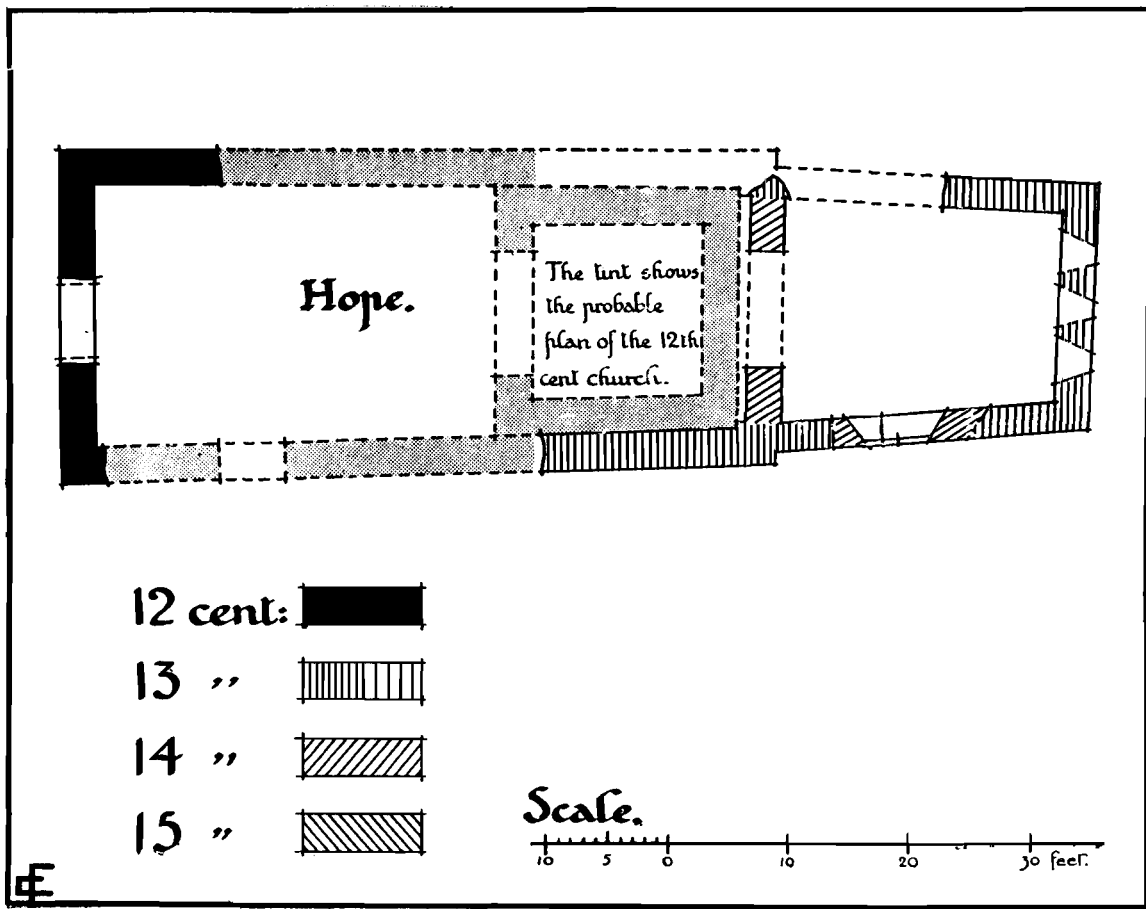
Ground Plan of Hope all Saints Church, 1925. Erwood.
